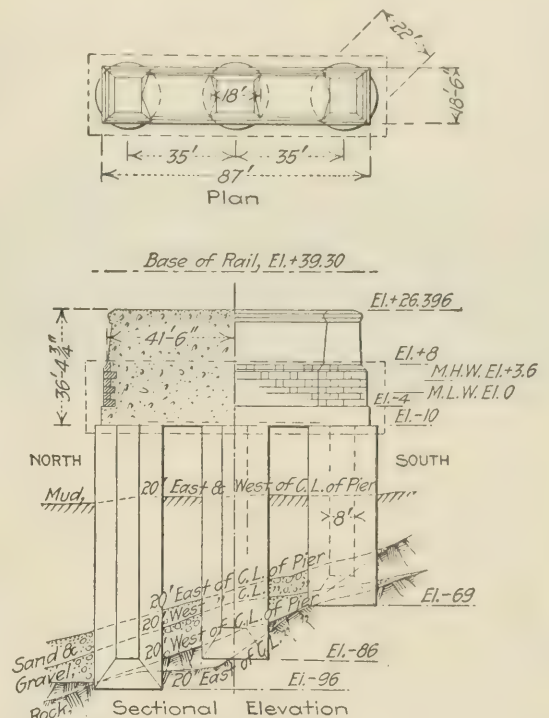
MULTIPLE-CAISSON PIER (PIER 4) OF NEW THAMES RIVER BRIDGE
